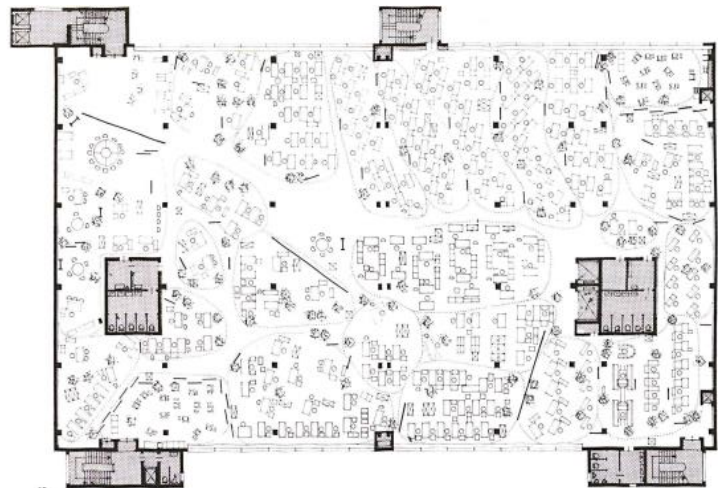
Buch und Ton office – plan of the floor. Source: Hookway B.
